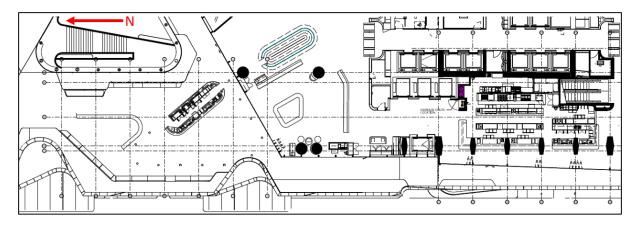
Proposed floorplans, including new southern kitchen, internal seating and fixtures, and bar area on northern terrace
